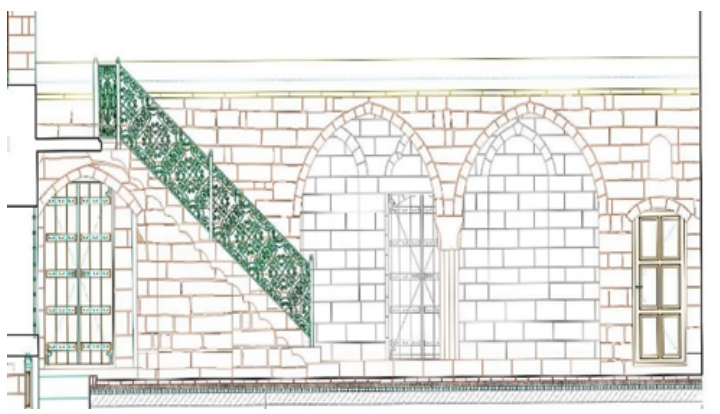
Analytical survey of the western façade of the building facing the courtyard
